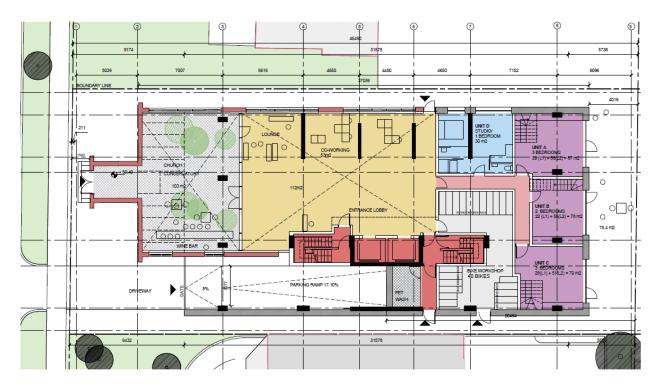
Proposed plan for the ground floor illustrated the reuse of the front of the church as a café/bar, ground floor amenity area, vertical circulation, and ground floor units along the south. The new podium/base (shown in red) reinstates the original material and height of the church is re-clad in salvaged with the salvaged red brick acknowledging the original treatment of the church. Source: Spice Studio/ CSV Architects Design Brief, August 2024.
